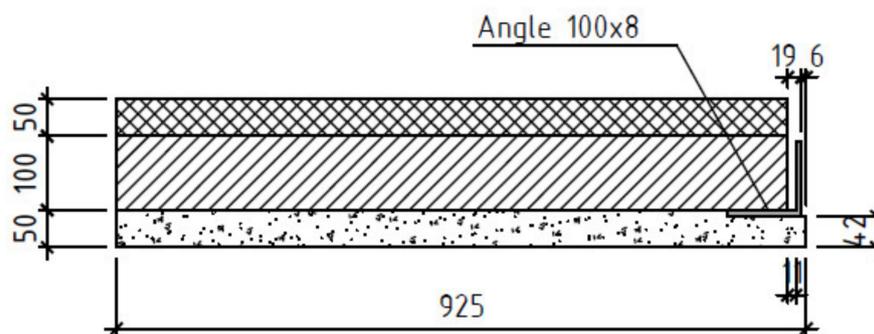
Calculation scheme without a gusset plate. The gaps between the angles and precast reinforced concrete elements are not filled with thermal insulation (units: mm).
